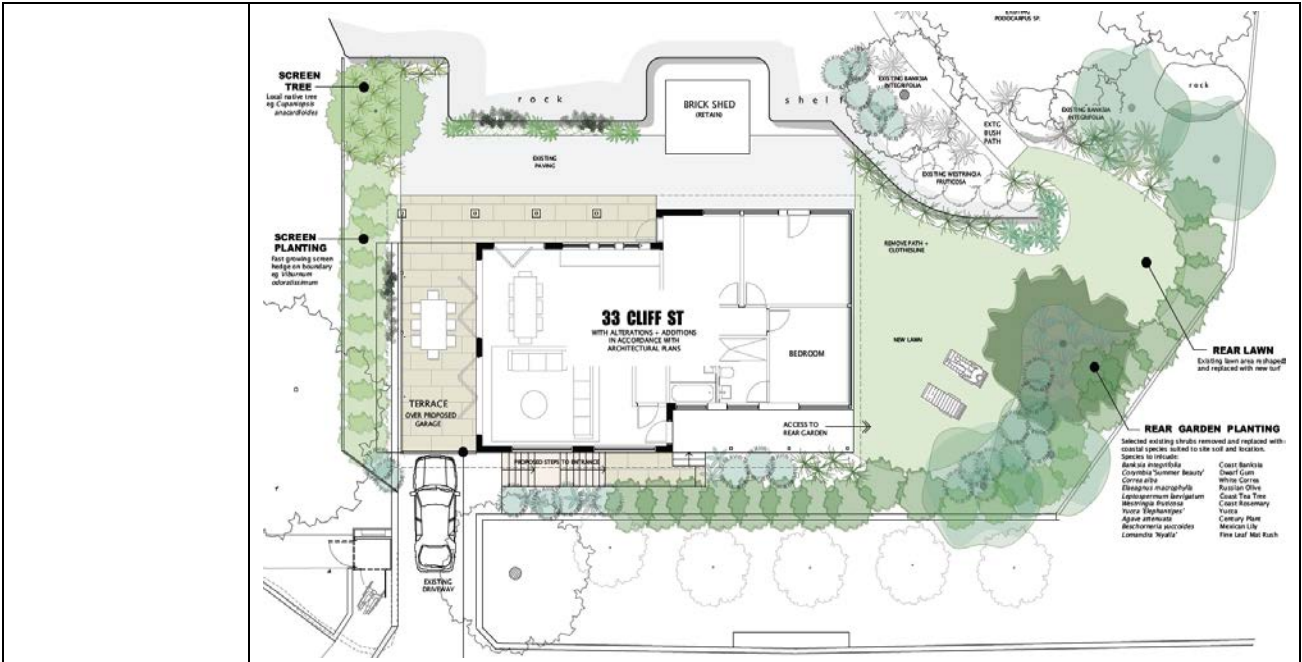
Proposed 33 Cliff Street (landscape plan)
